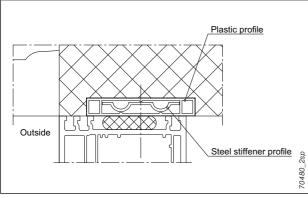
Window connection using plastic profile with stiffener profile made of steel
